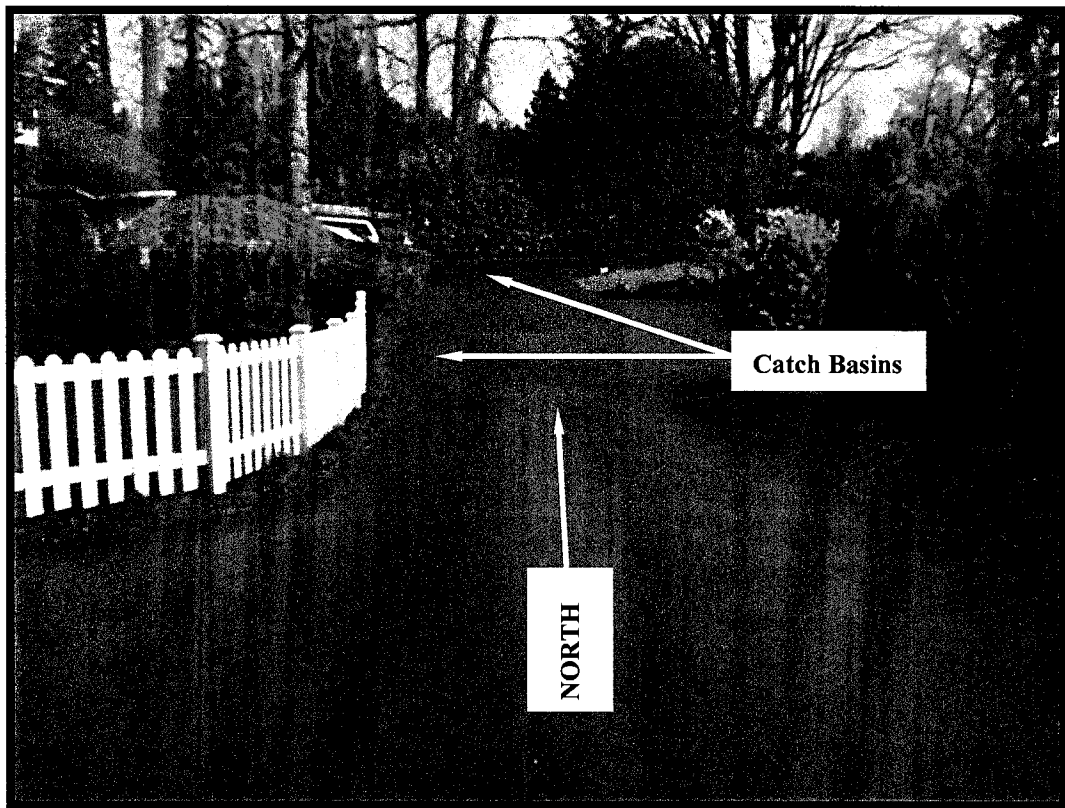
Driveway leading from 3211 – 84th Avenue SE north to Coval south property line.
